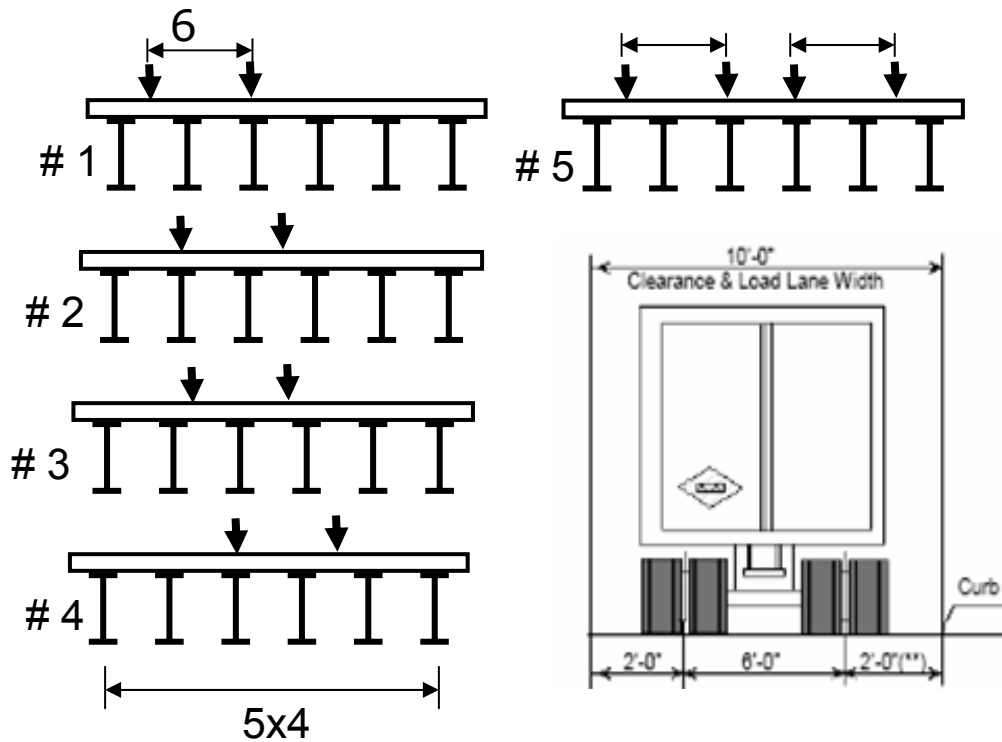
Loading plans for service load test (#1- 4 single truck, #5 double truck)
